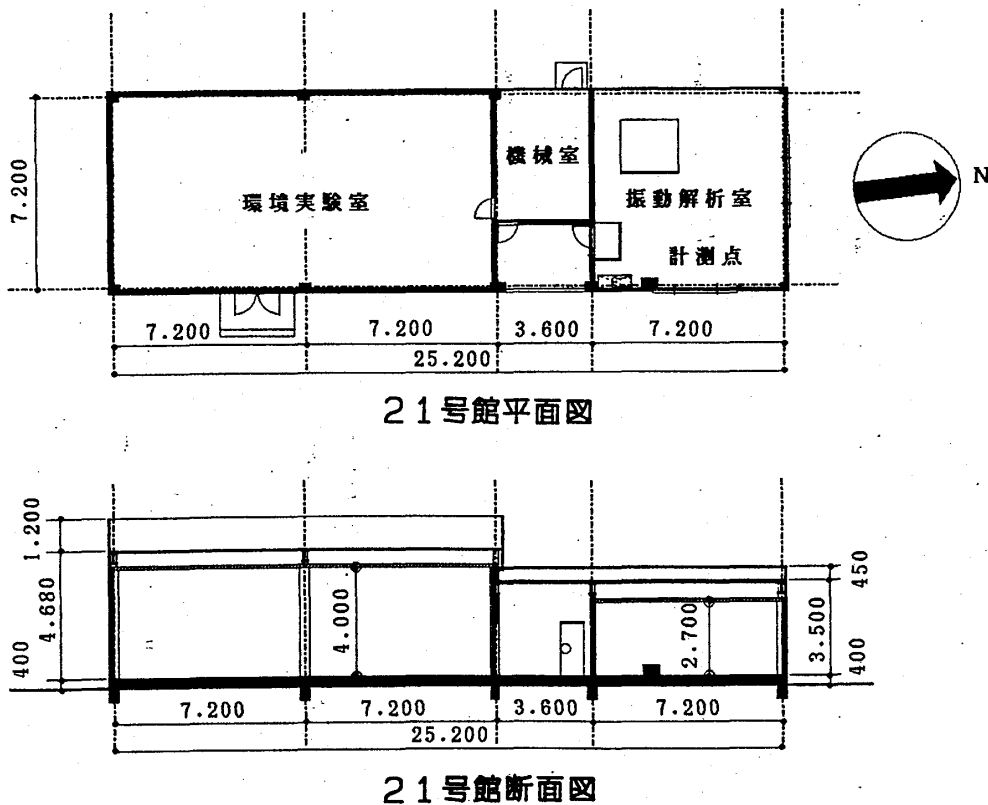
Plan and Section of School House No.21. Fukuyama University.
